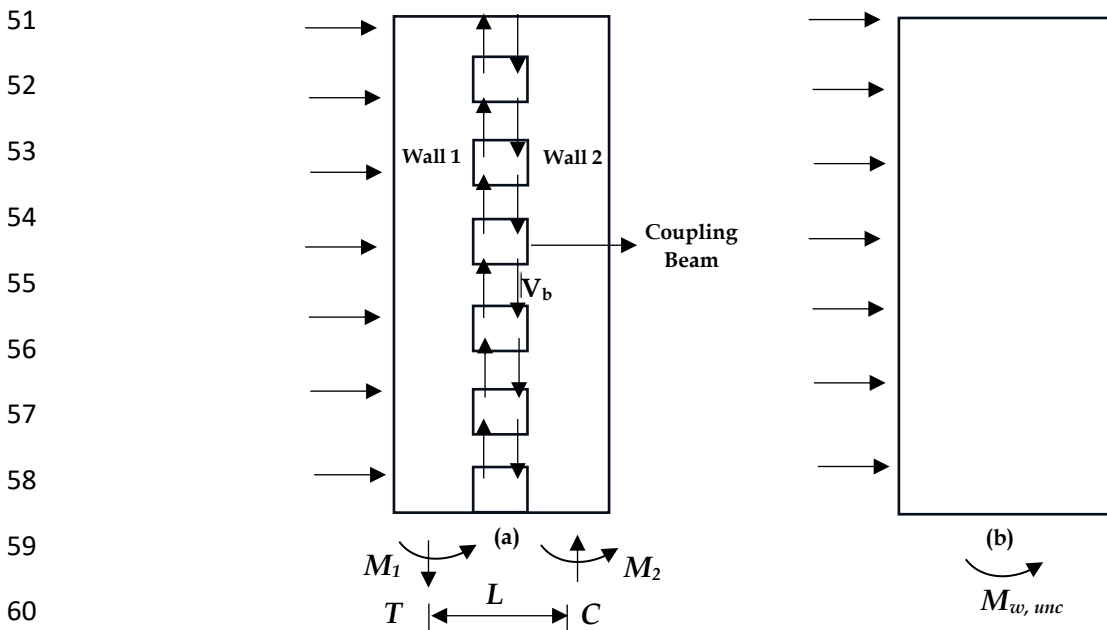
Wall systems (a) coupled wall (b) uncoupled walls
